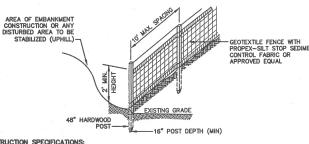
DETAIL SHEET SULLIVAN SUBDIVISION 8 WHITTAKER DRIVE,STRATHAM, NH 03885 Project: ROBIN SULLIVAN 8 WHITTAKER DRIVE, STRATHAM, NH 03885 Owner of Record:
